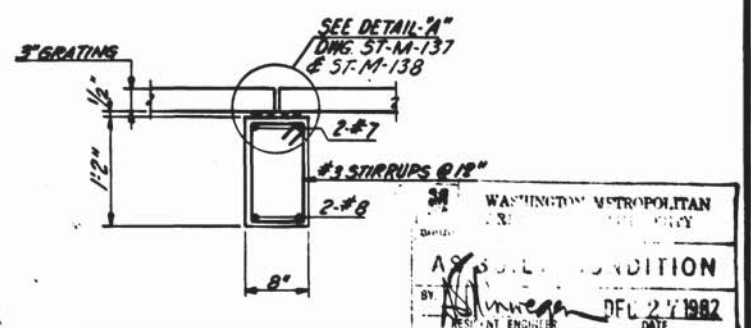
" S-136 APPLICABLE BELOW ROCK LEVEL
